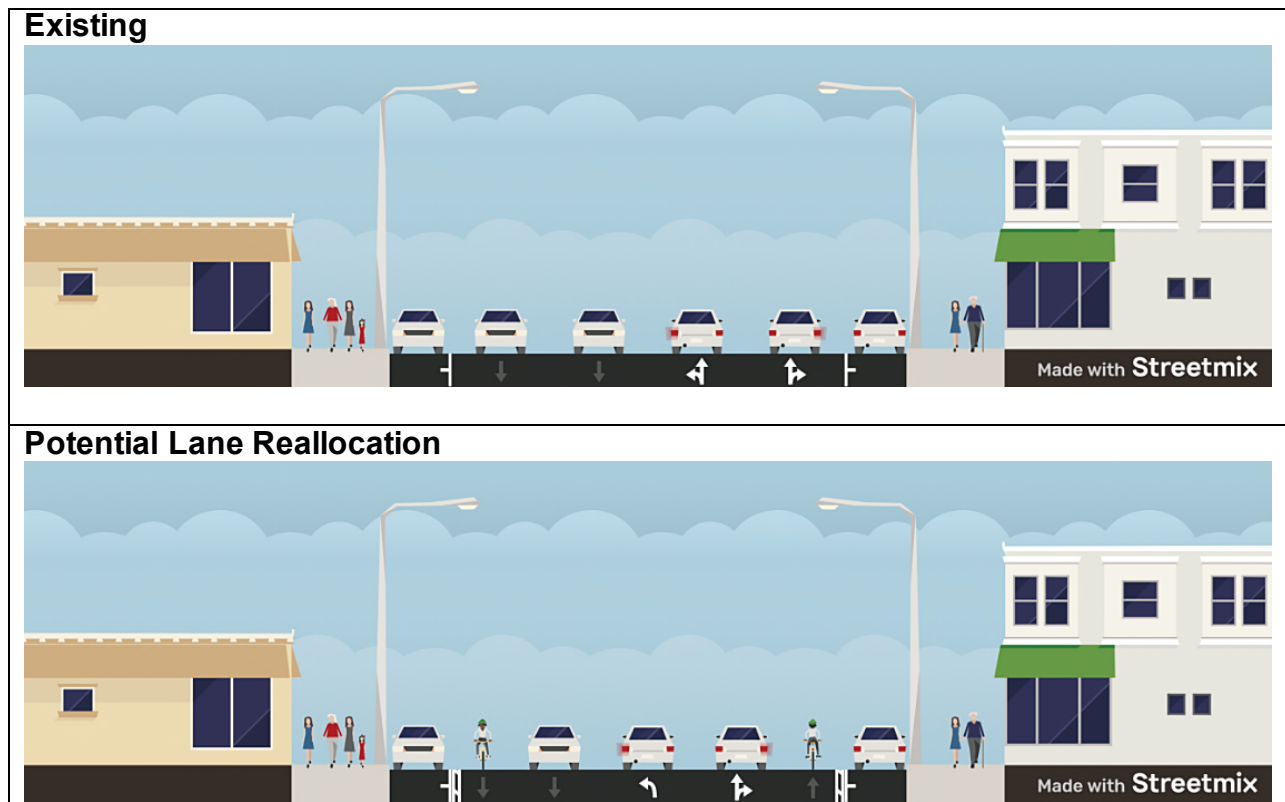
Example Existing and Potential Cross-section in BIA "Main Street" Areas (Wyandotte St. E., East of Pillette Road Looking West)
